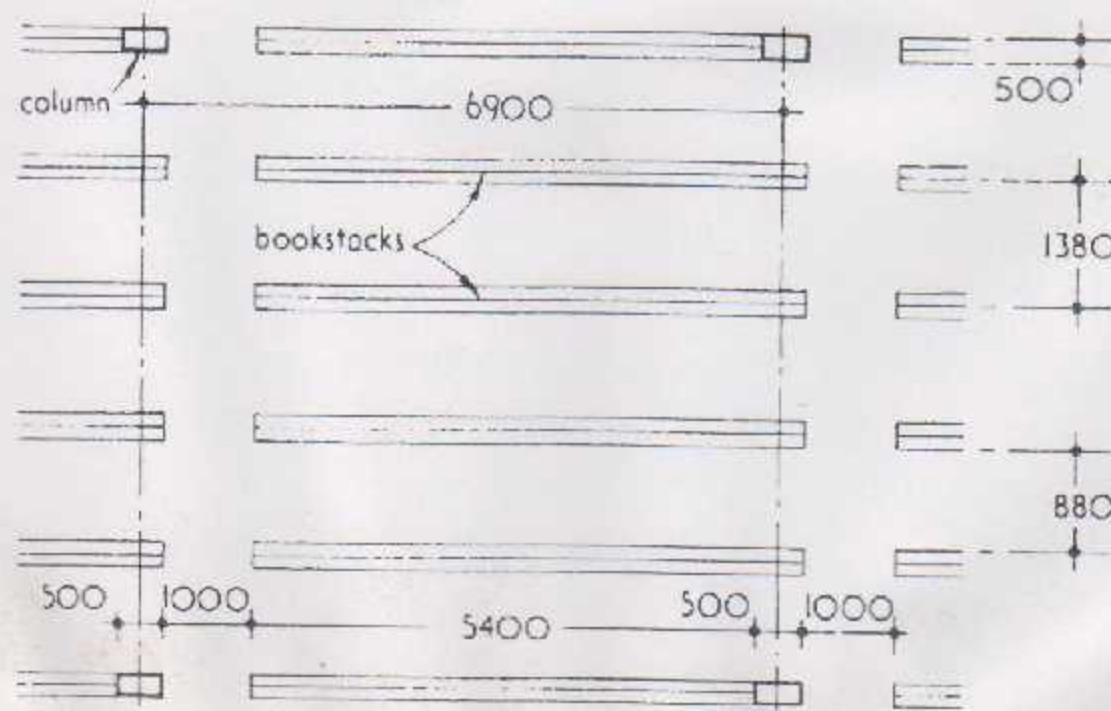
Capacities of book stacks within a 6900 mm structural
